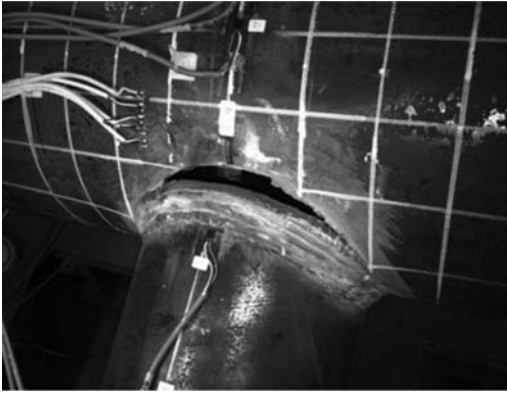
Cracked chord at the weld toe due to monotonic loading – specimen T1.
